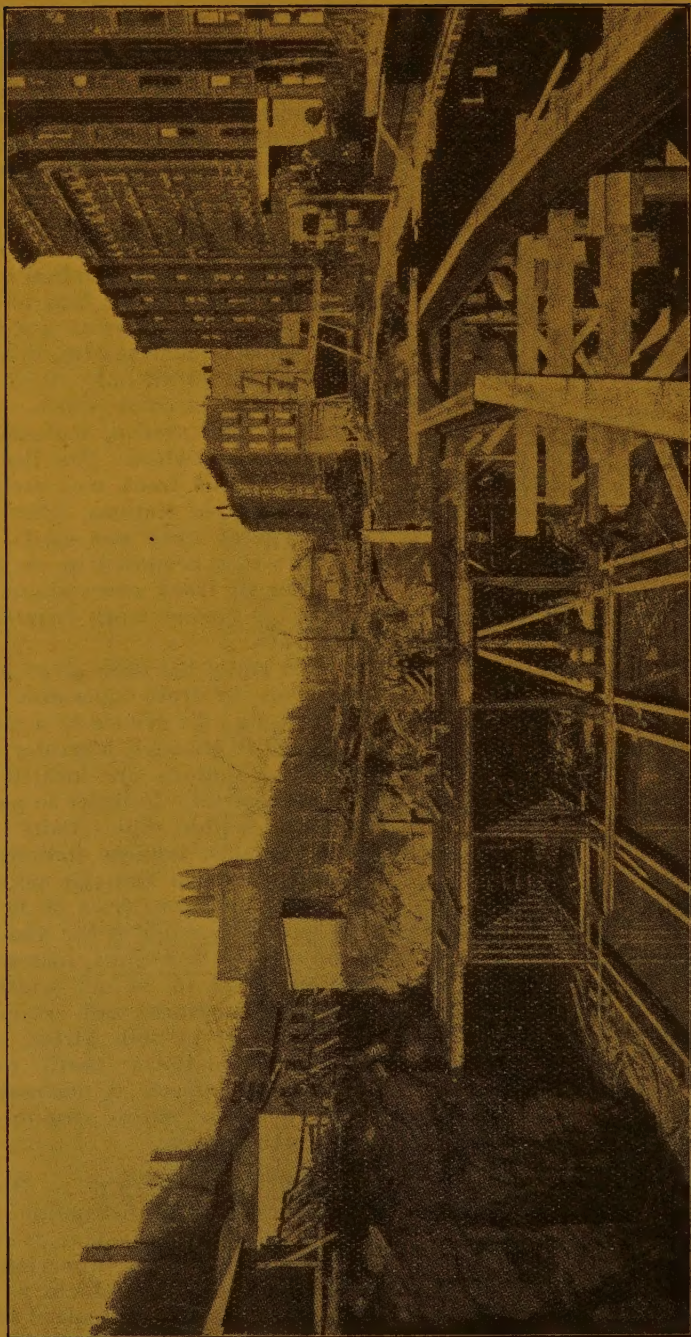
Steel-frame box construction, typical of new system as well as its predecessors.
